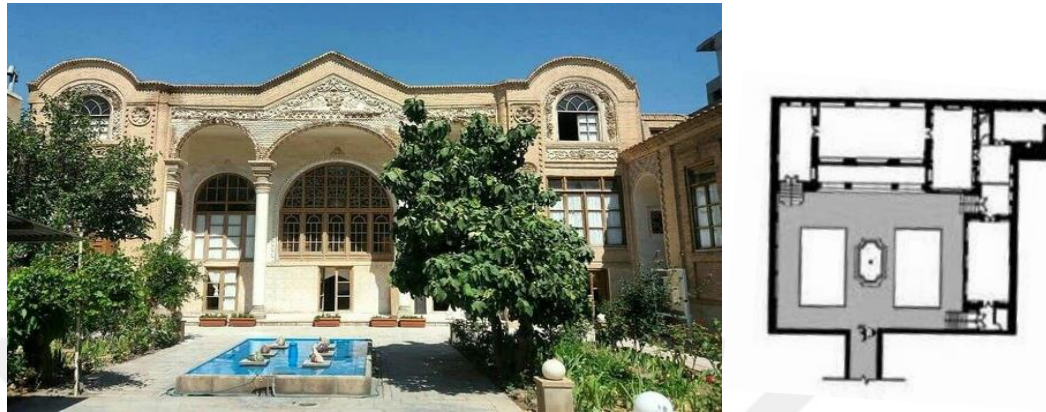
Picture and plan of Tabriz courtyard house example - Alavi house
